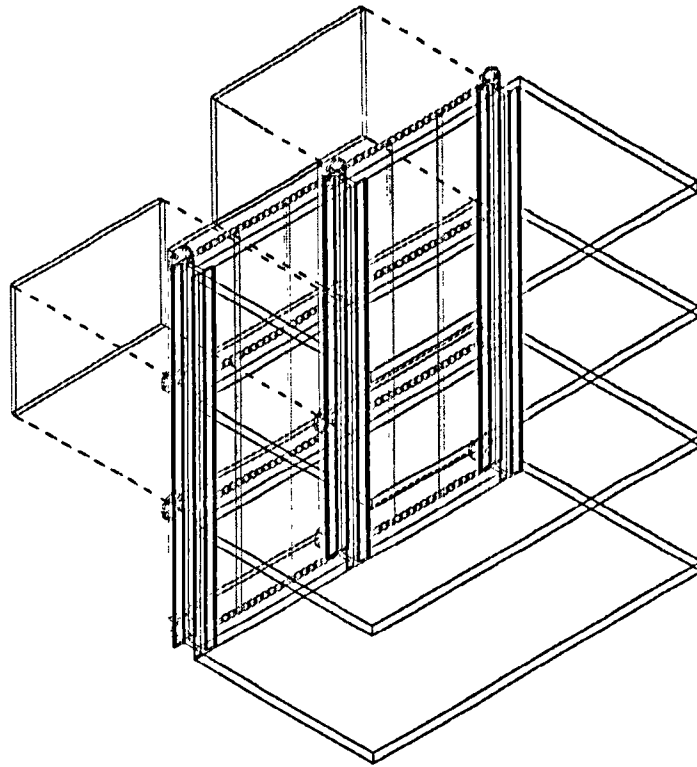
Sandwich rail system (Source: Development of PV Cladding System ETSU 1996)
